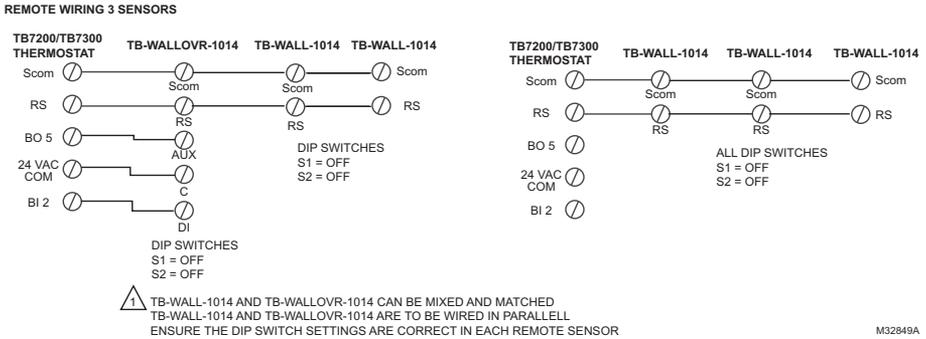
Wiring examples of three remote wall mounted room sensors for averaging applications
